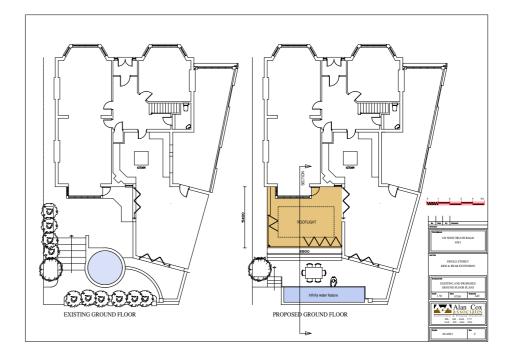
Existing & Proposed Ground Floor Plan - 229 West Heath Road
